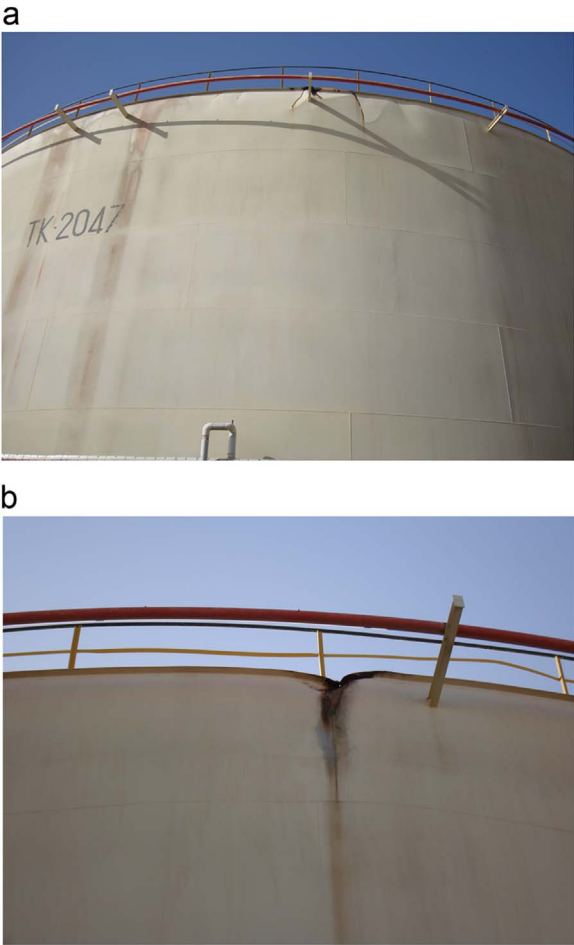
Buckled tank (TK-2047) due to vacuum pressure and partially shell corrosion (upper part corrosion): (a) upper course (corroded region) buckling (south view of the tank) and (b) buckling deformation (east view of the tank).
